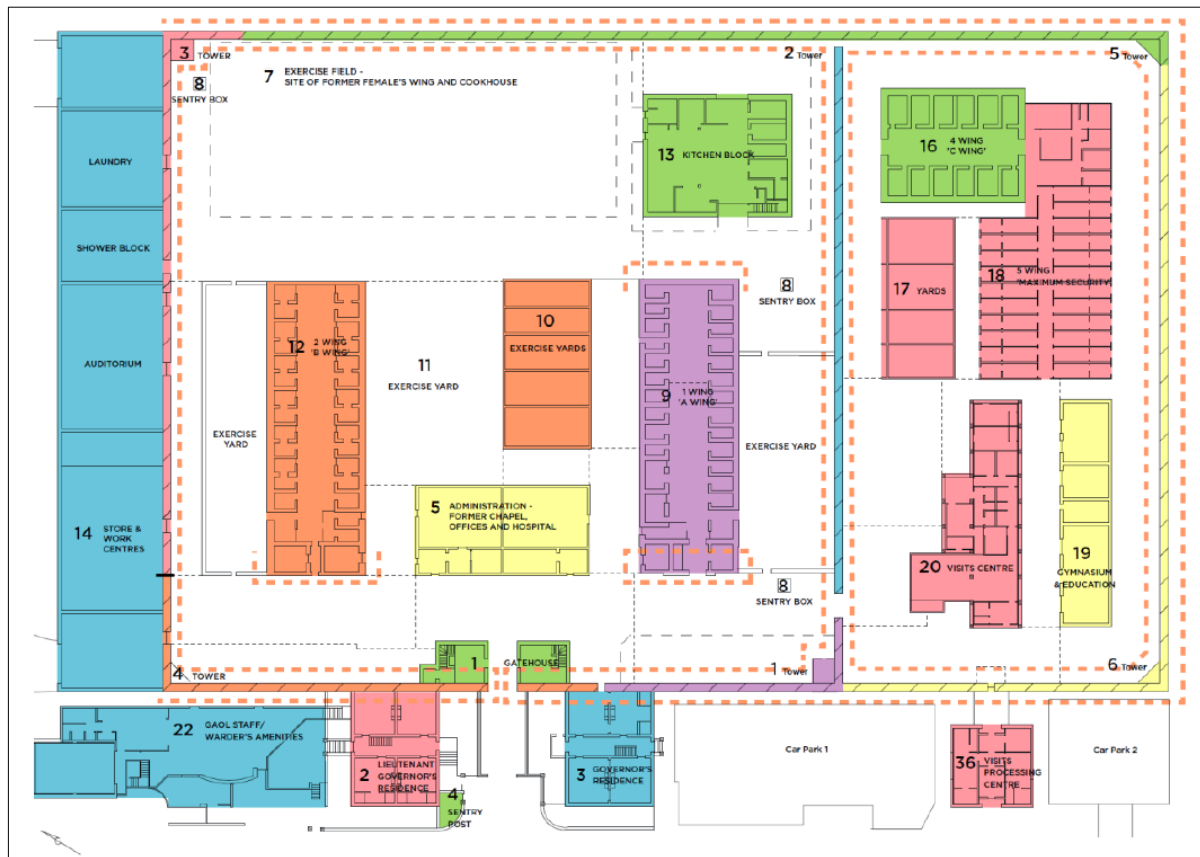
Maitland Gaol Site Layout. Source: Maitland Gaol Development Plan (2020) – Buildings 2 & 3 applicable to this DA.
